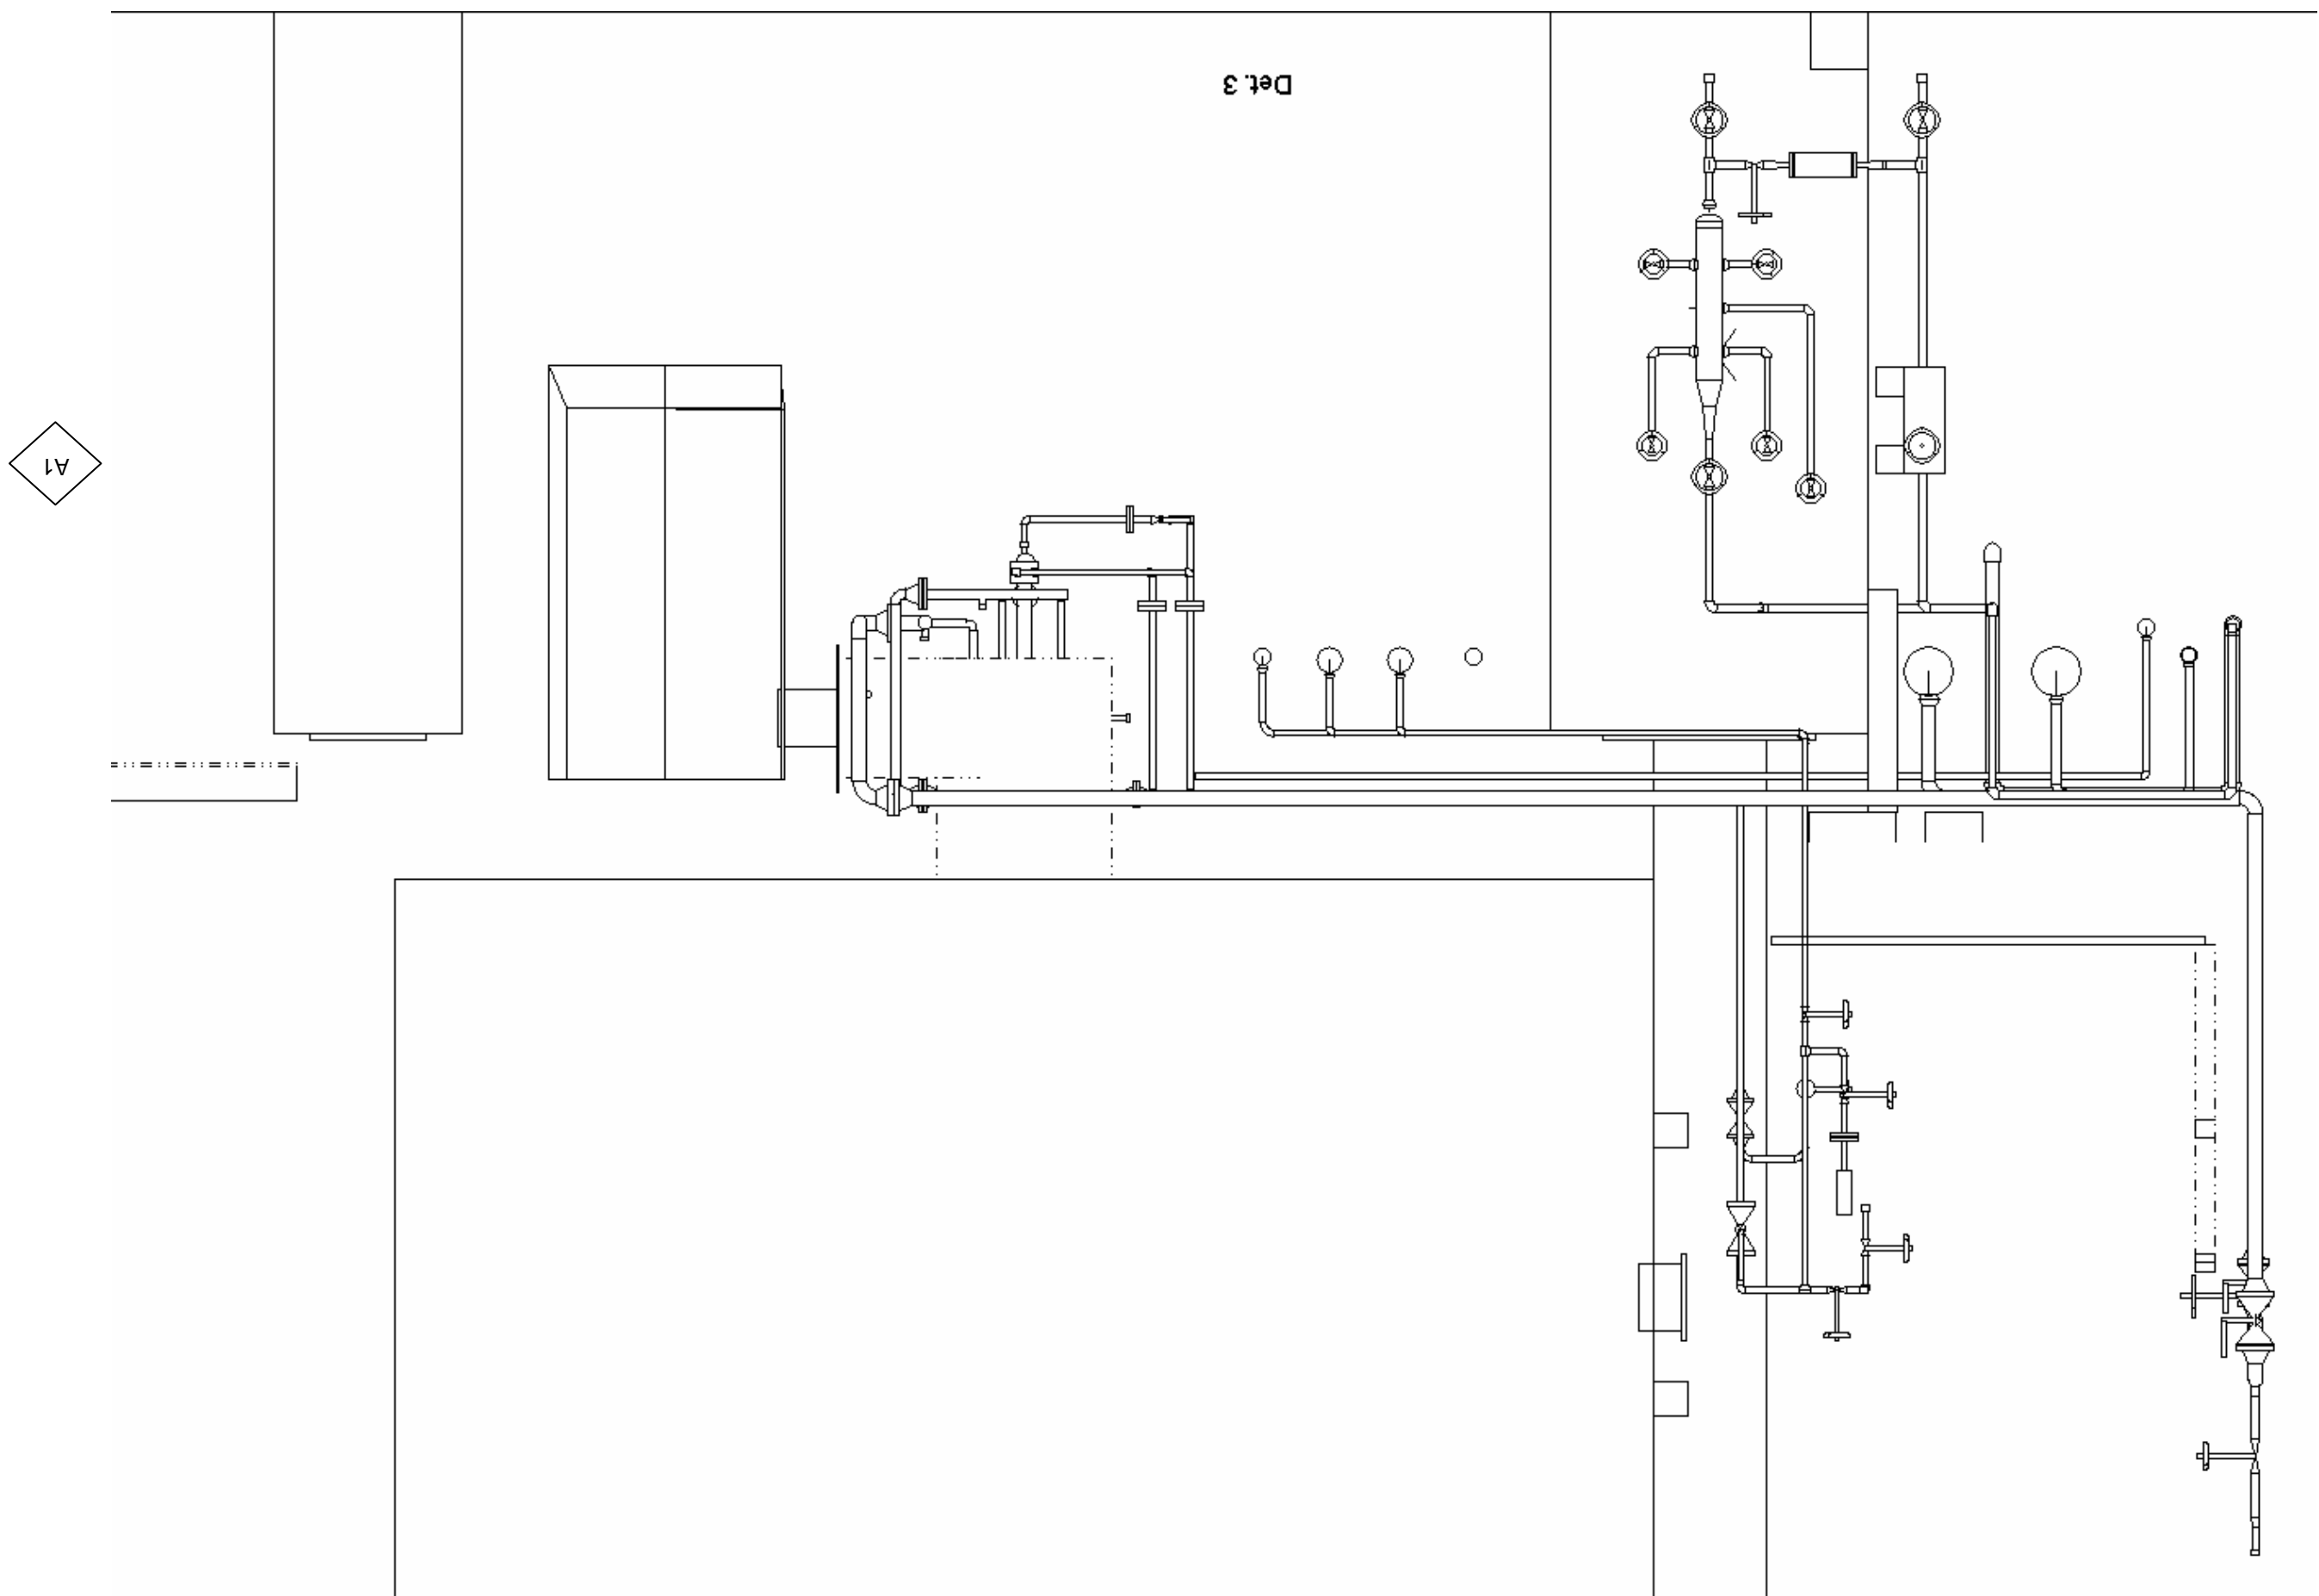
Example of typical installations of piping around box heaters
